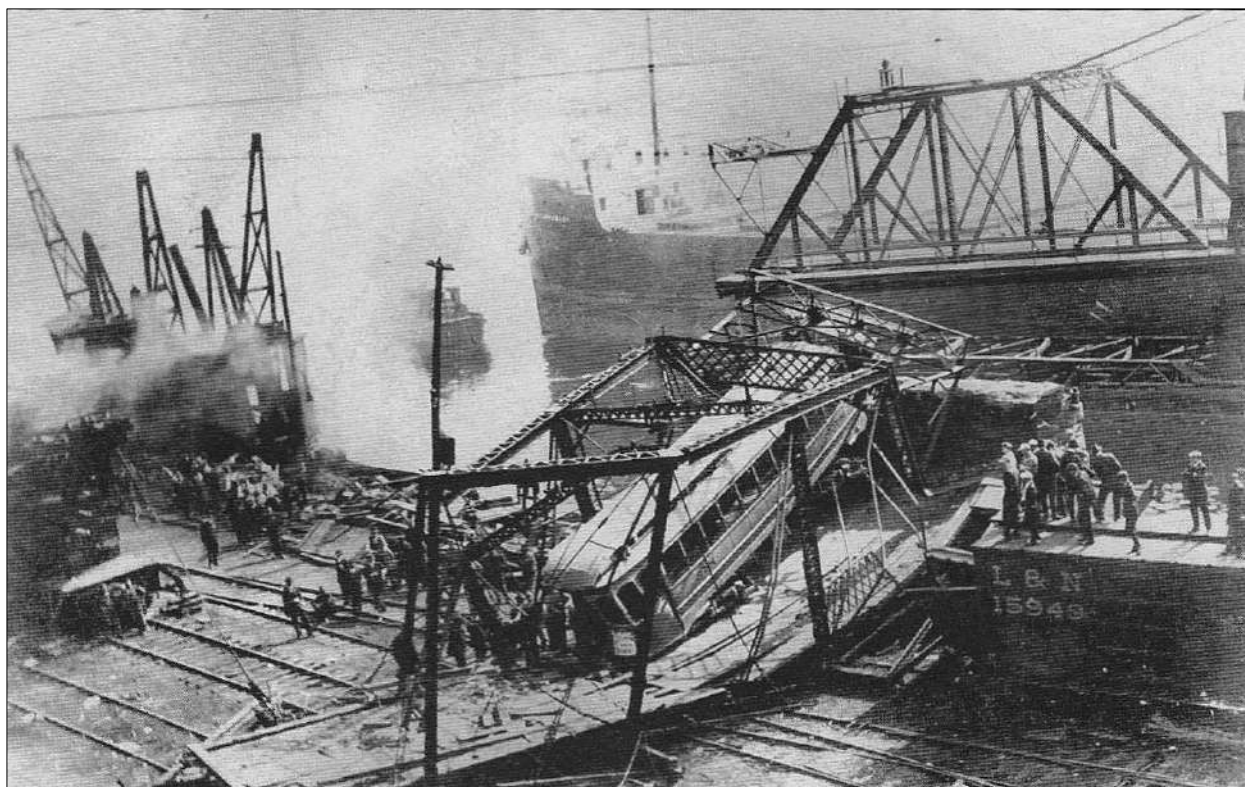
Scranton Road Line, West 3rd Street Bridge Collision, October 1916.
